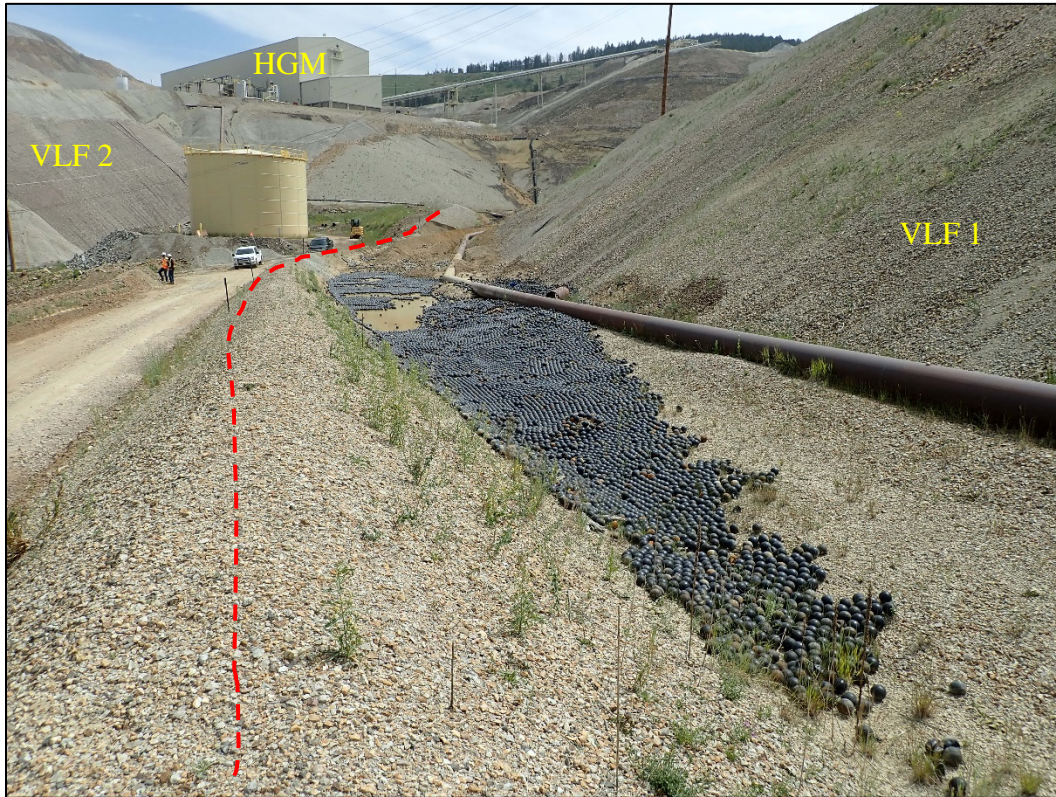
Infiltration pond and Edge of Liner (red); looking northeast.
